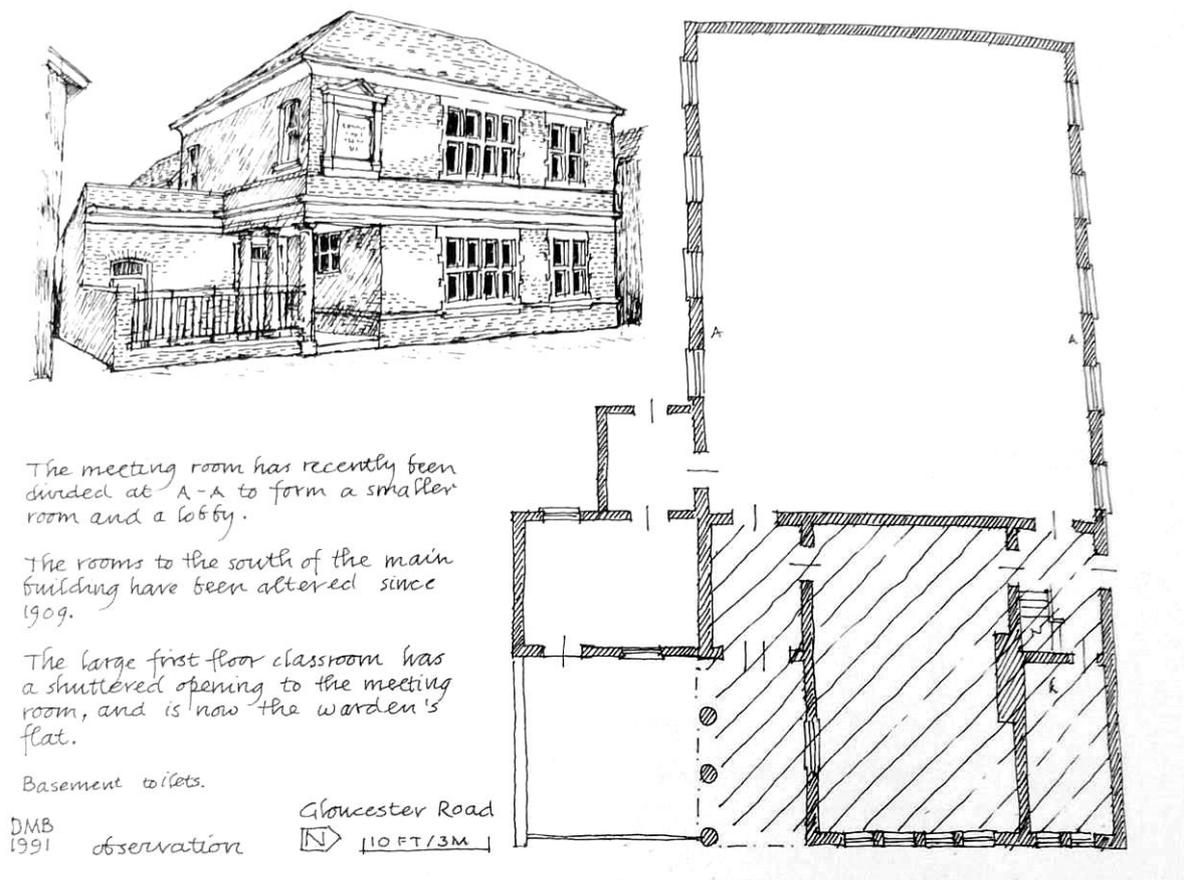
Ground floor plan and elevation, from Butler, Vol.2, 1999, p. 526
